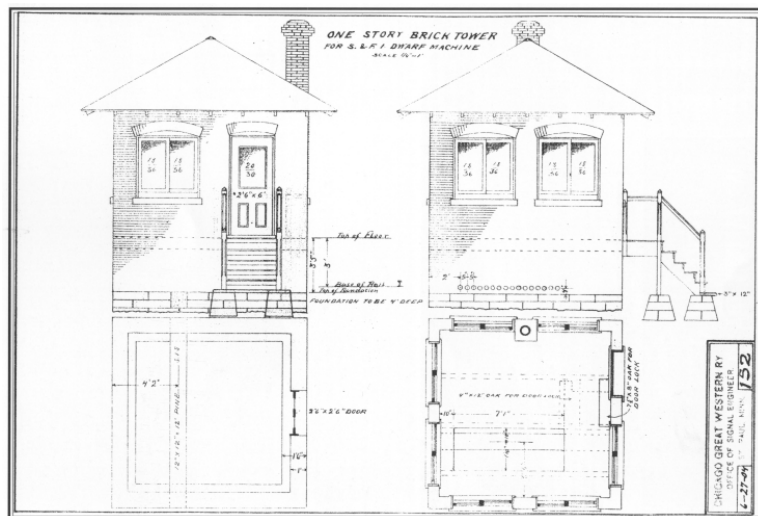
Elevation plans of the type of brick interlocking tower found at Winston Station (Pierson 2001:25).
